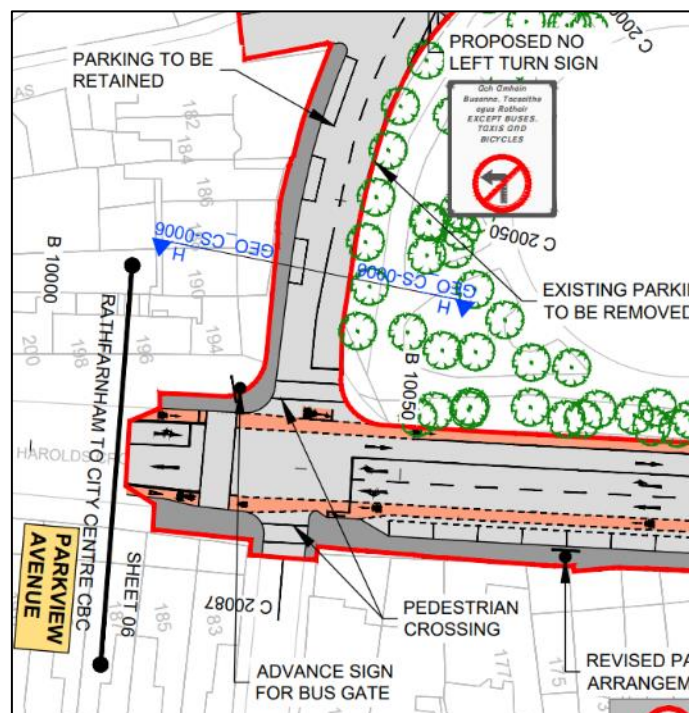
Junction of Kimmage Road Lower and Park View Avenue
